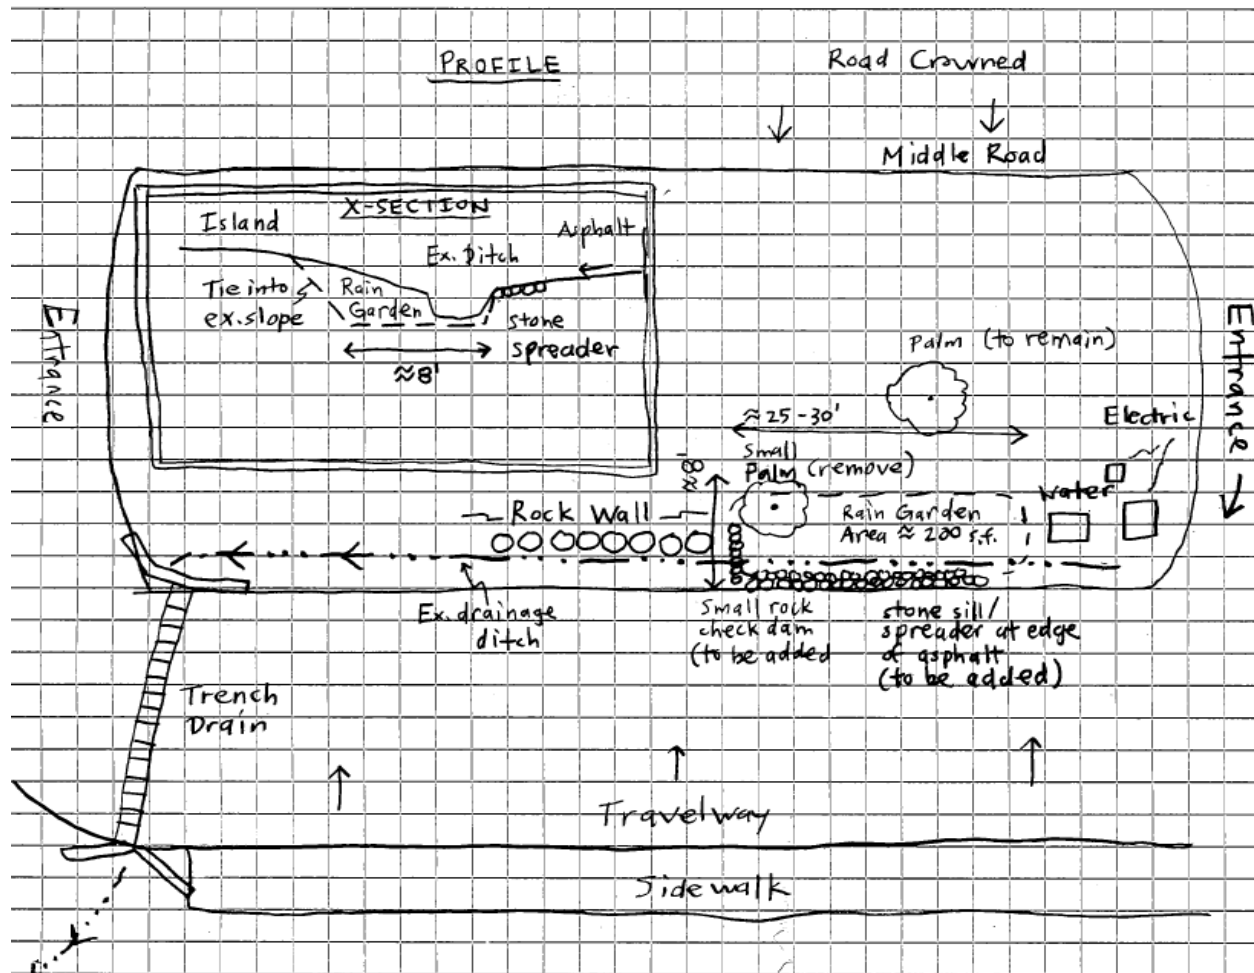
Design sketch for rain garden; plan view and cross section. Note existing utilities, drainage ditch, and trees.
